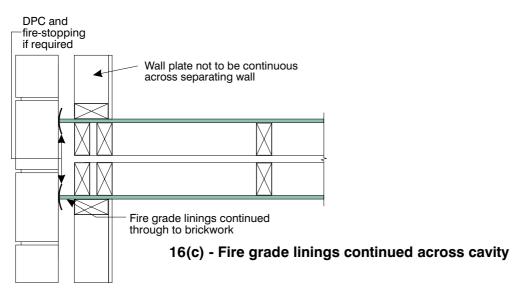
INTERSECTION WITH BRICK VENEER EXTERNAL WALL
